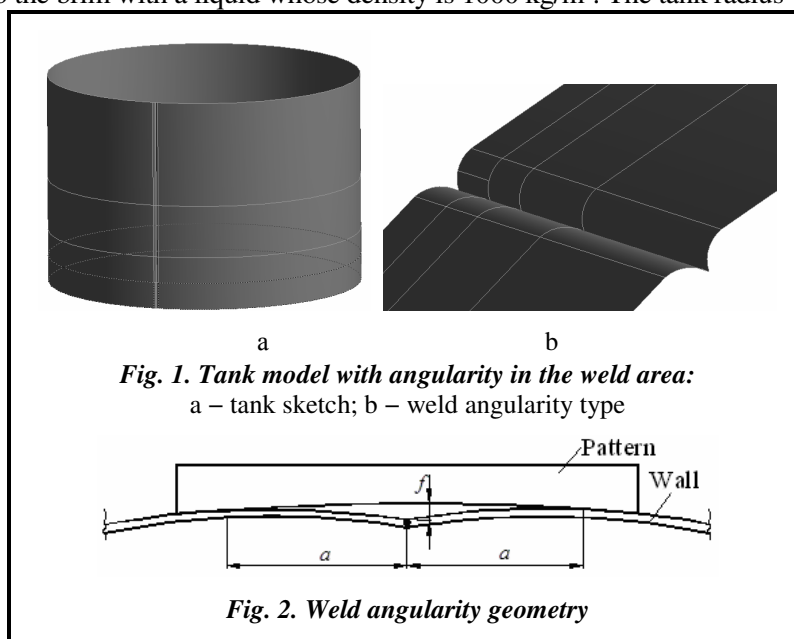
Tank model with angularity in the weld area: a – tank sketch; b – weld angularity type
